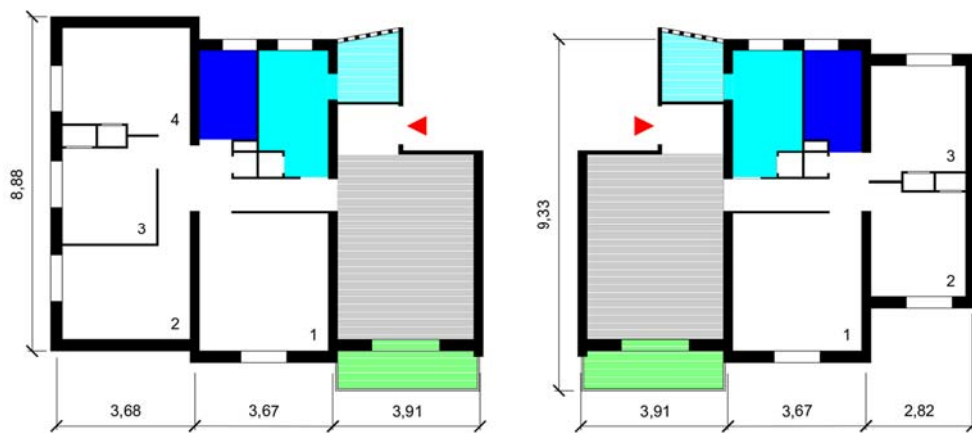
Type 2 and option. Floor plan. Source: Own elaboration. 2019.
